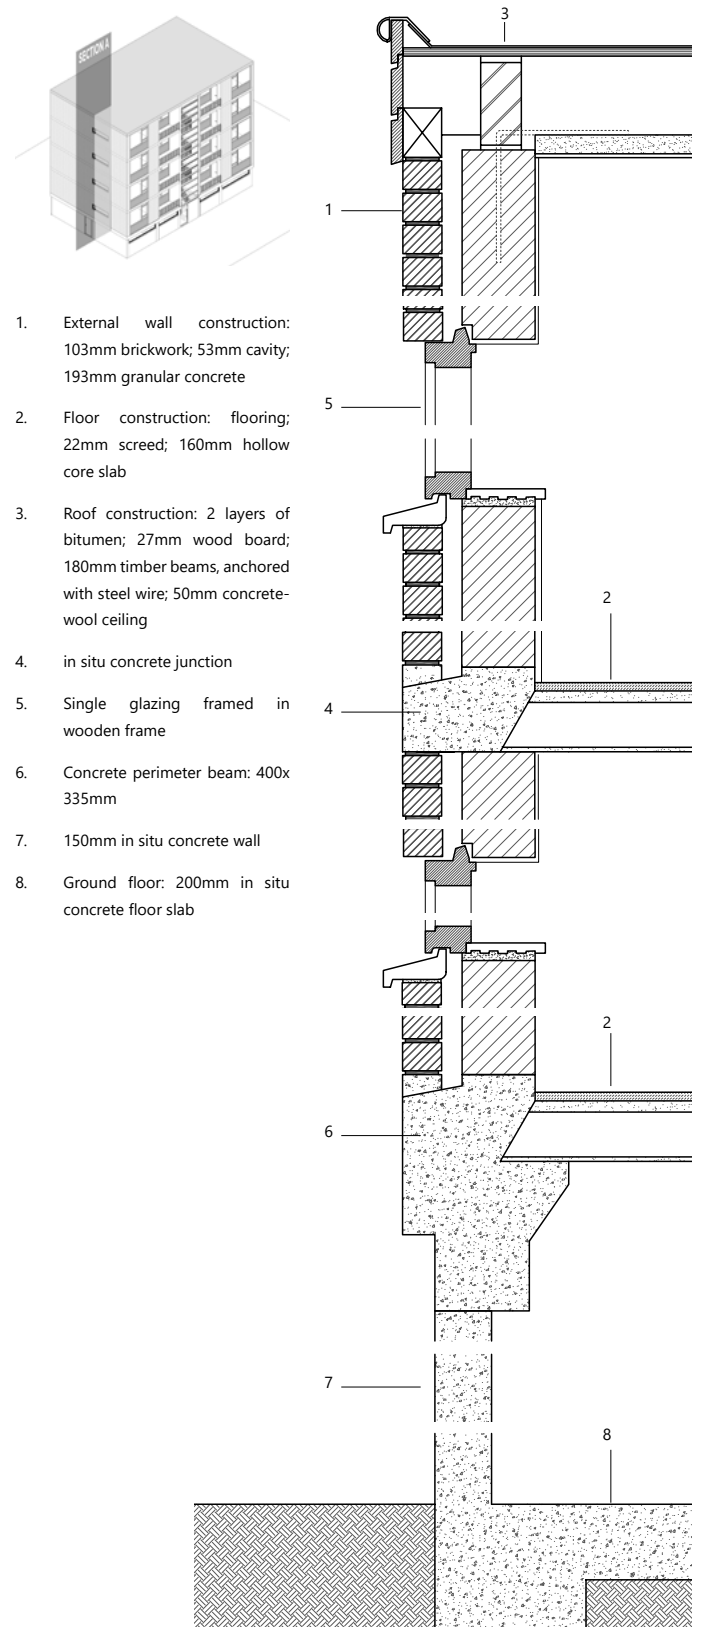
detailed section through north elevation (1:20) redrawn from archived drawings.
